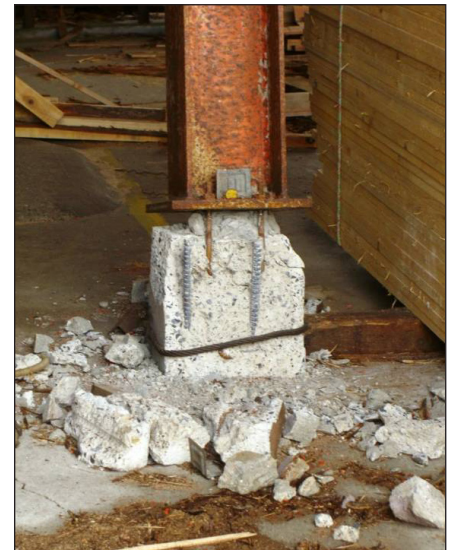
Collapse of steel industrial building, Doge (photos: Scawthorn).
